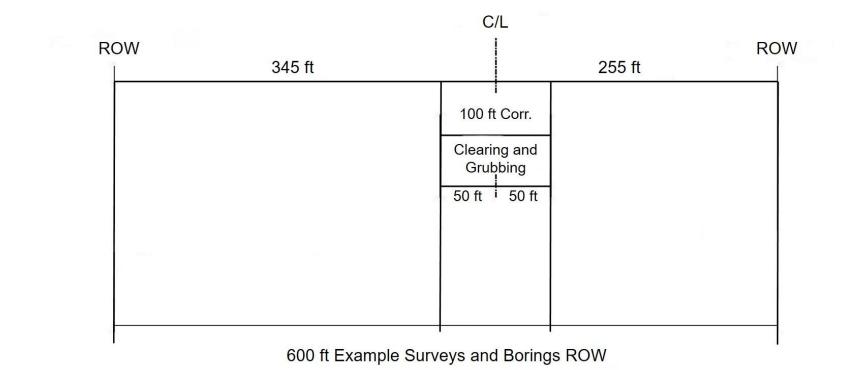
Plan view drawing of a typical ROW for the proposed action.
